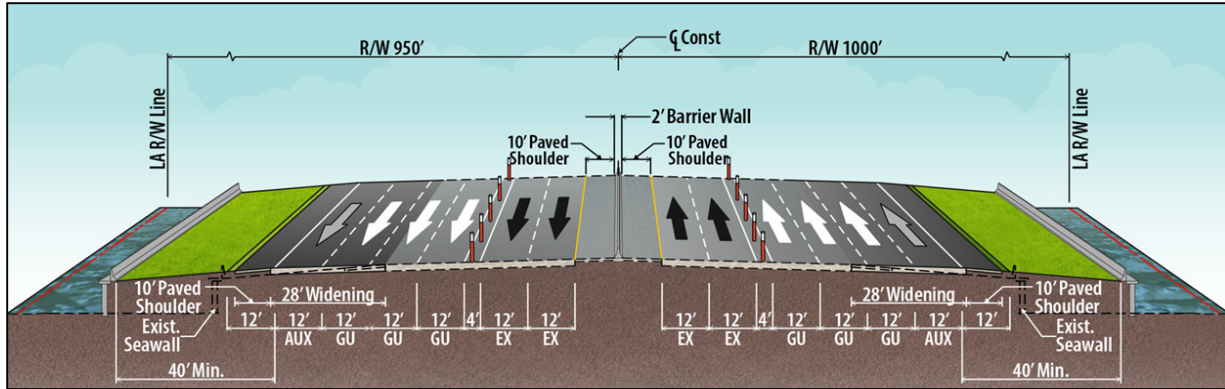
I-275 Mainline Master Plan Build Alternative Typical Section from north of 4th Street North to 1.0 mile south of the Howard Frankland Bridge (Segment C-MP4)
